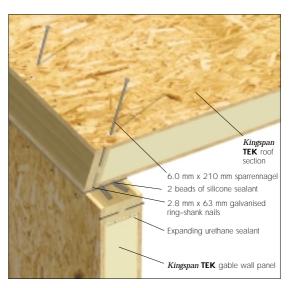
FIXING ROOF SECTION INTO GABLE WALL (NO OVER HANG)
